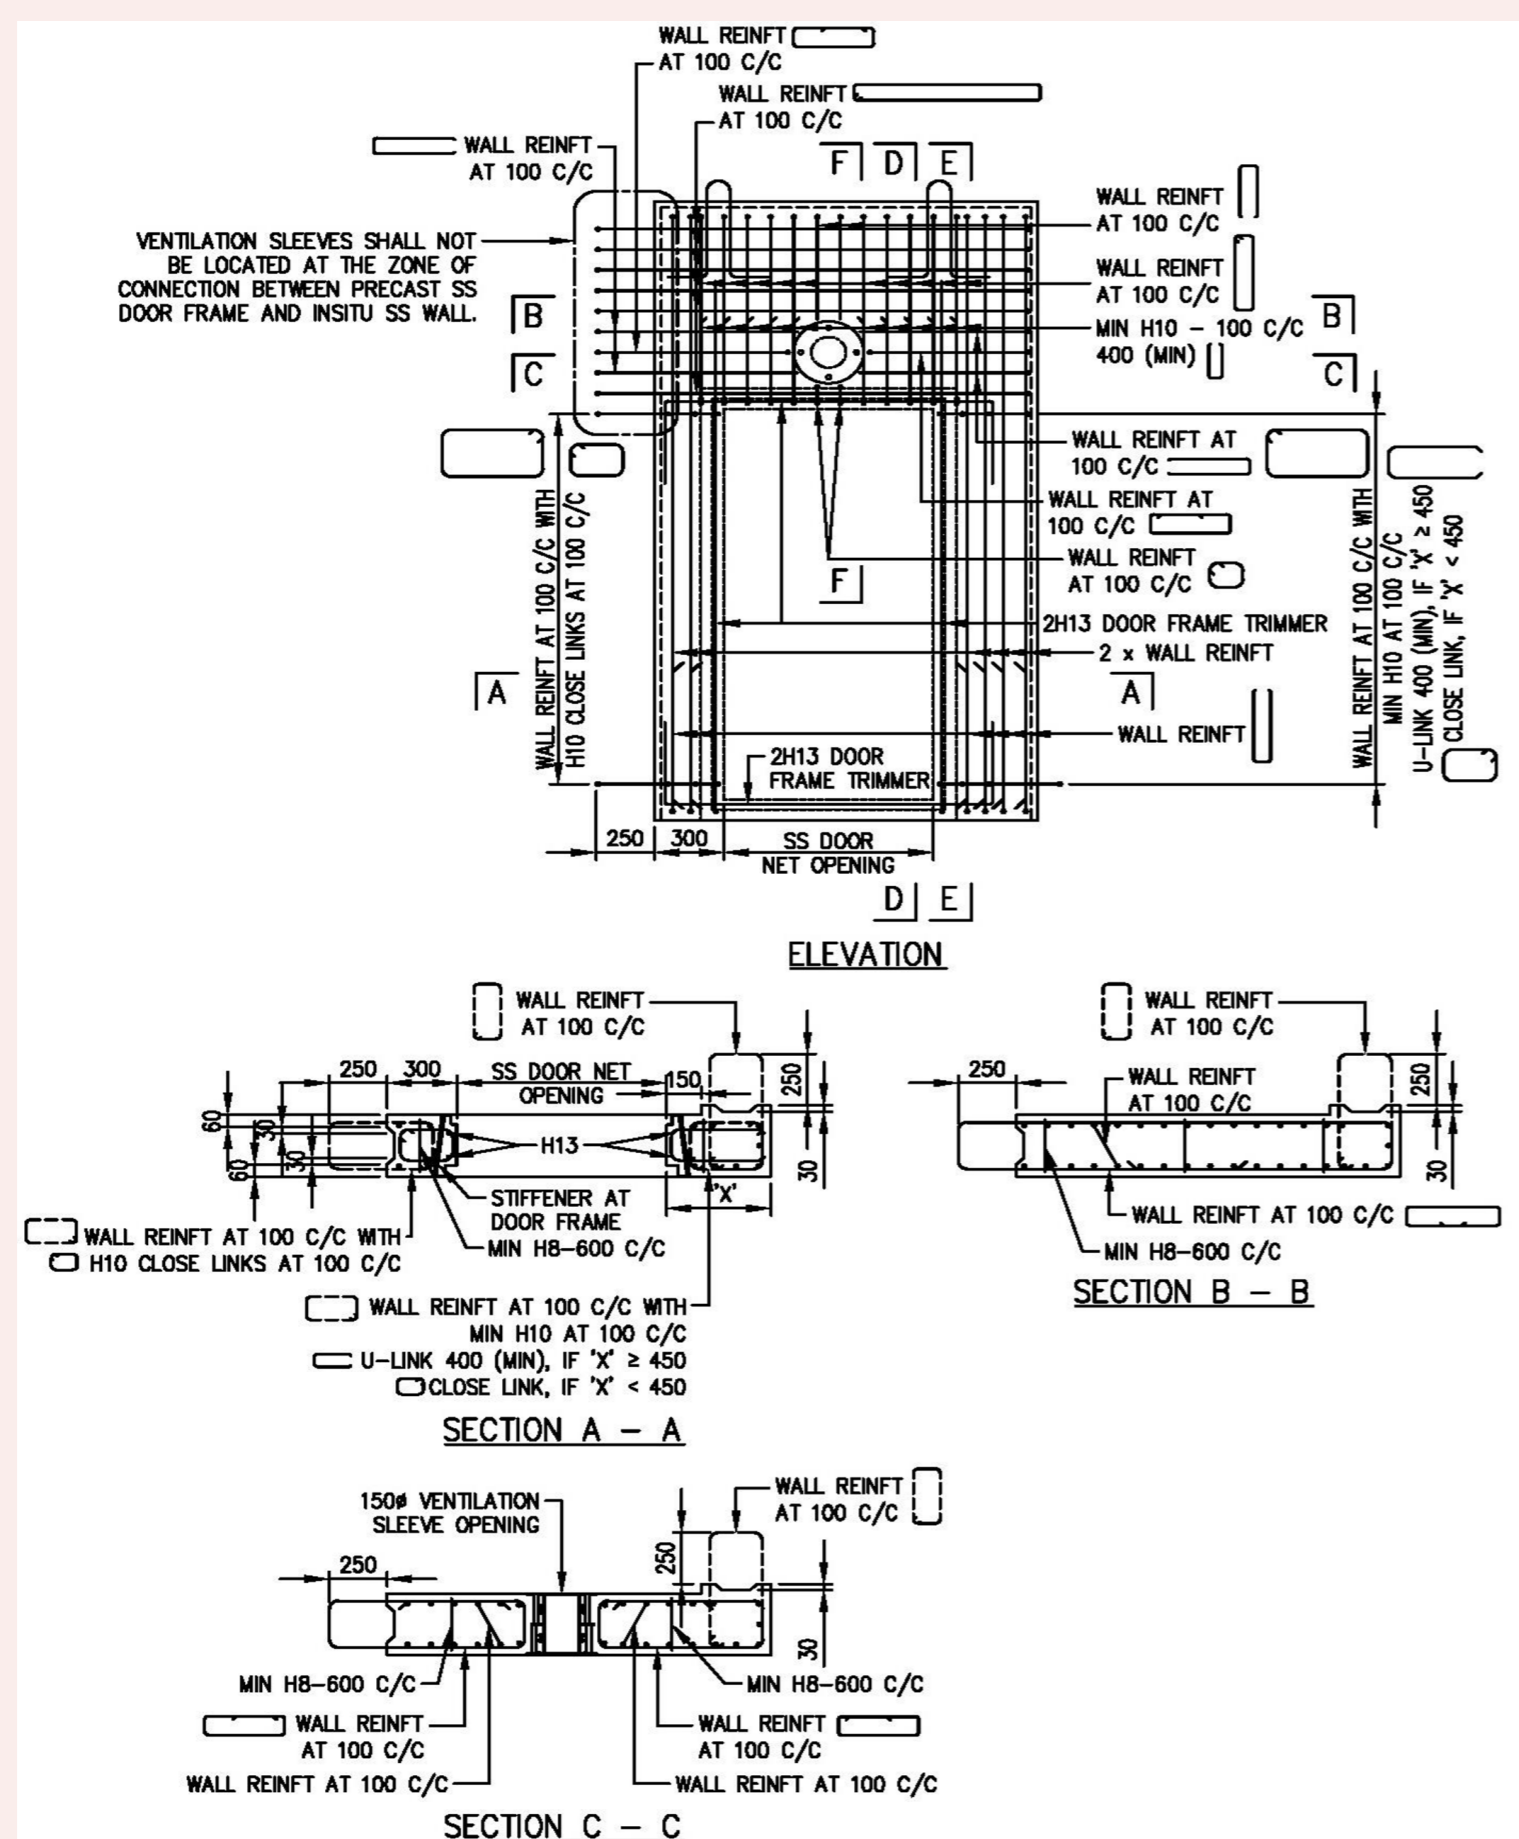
(h): SECTIONS OF PRECAST SS DOOR FRAME PANEL WITH VENTILATION SLEEVE ABOVE IT (TYPE 2)
